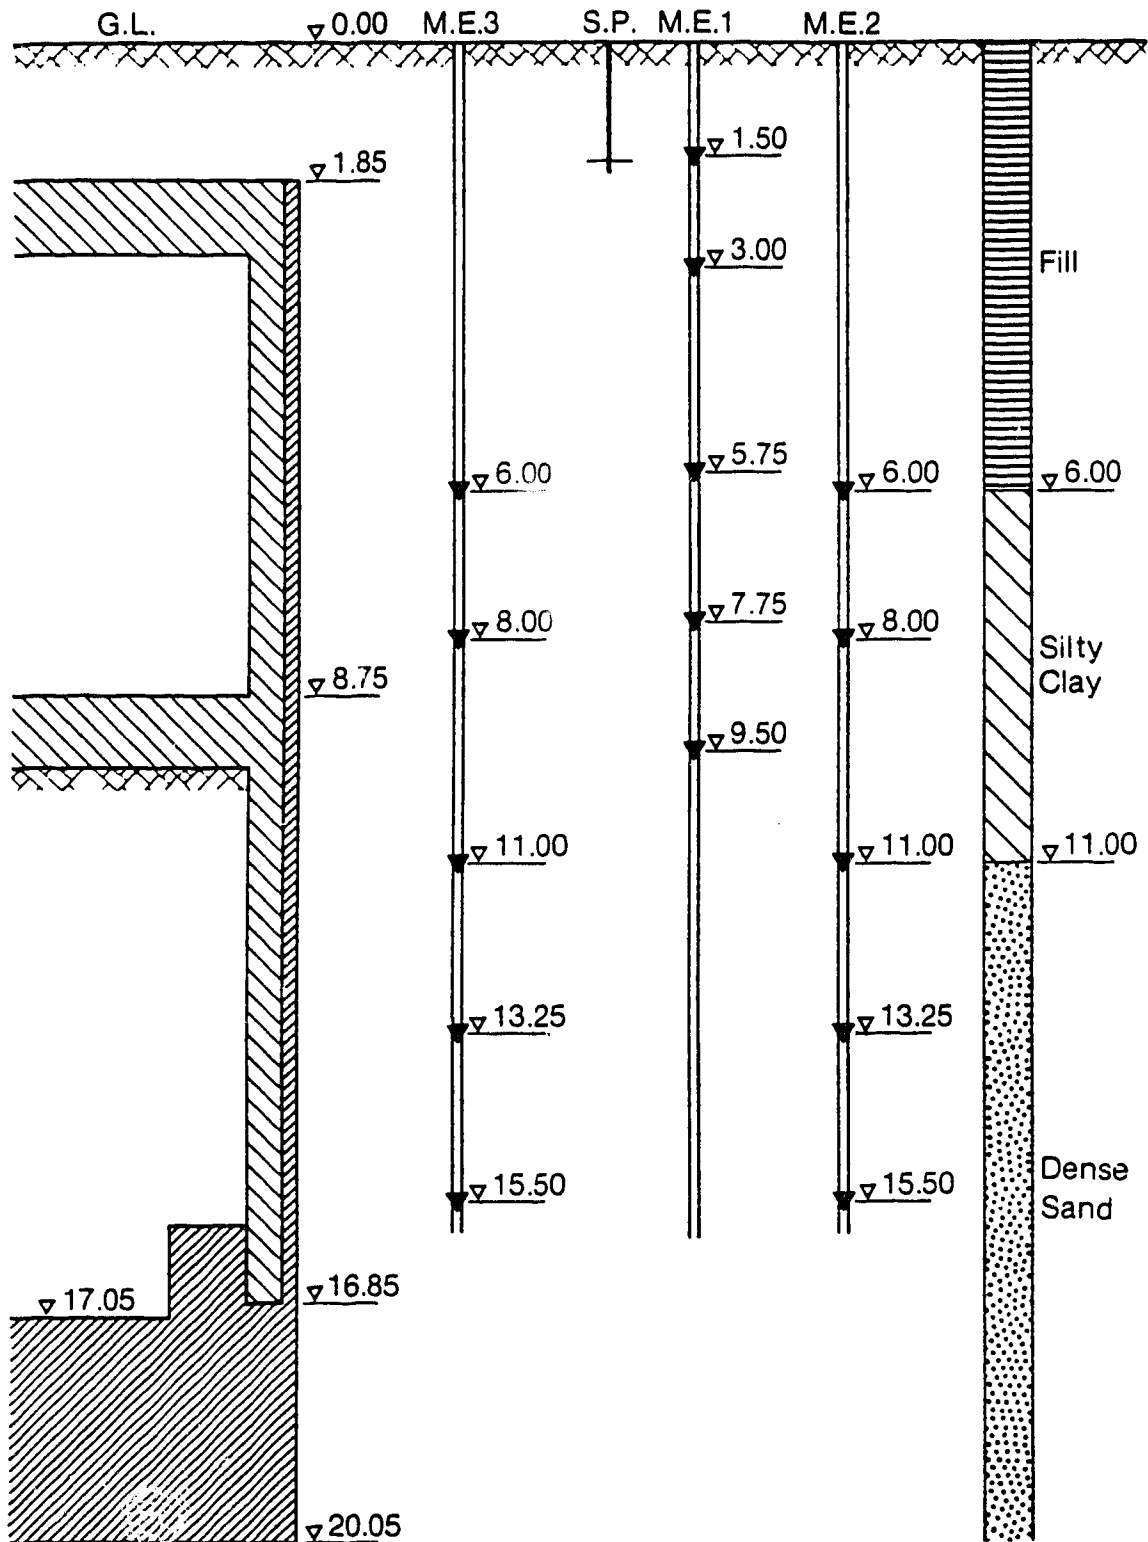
Details of the Multipoint Extensometers at the Tunnel Test Section
